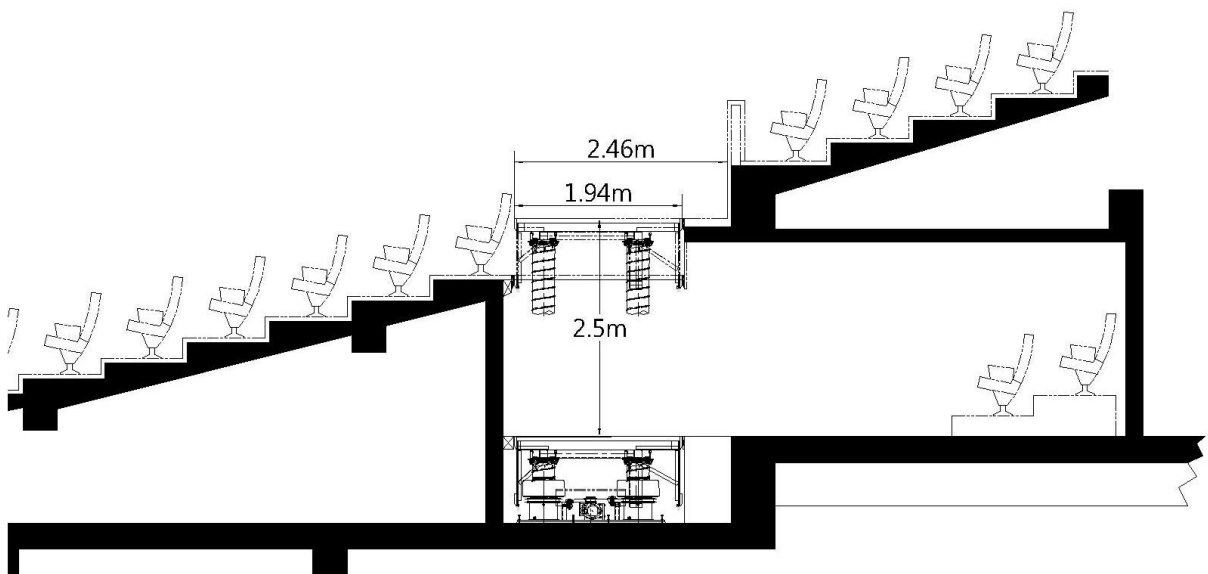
Auditorium Control Area Elevation Platform location plan
